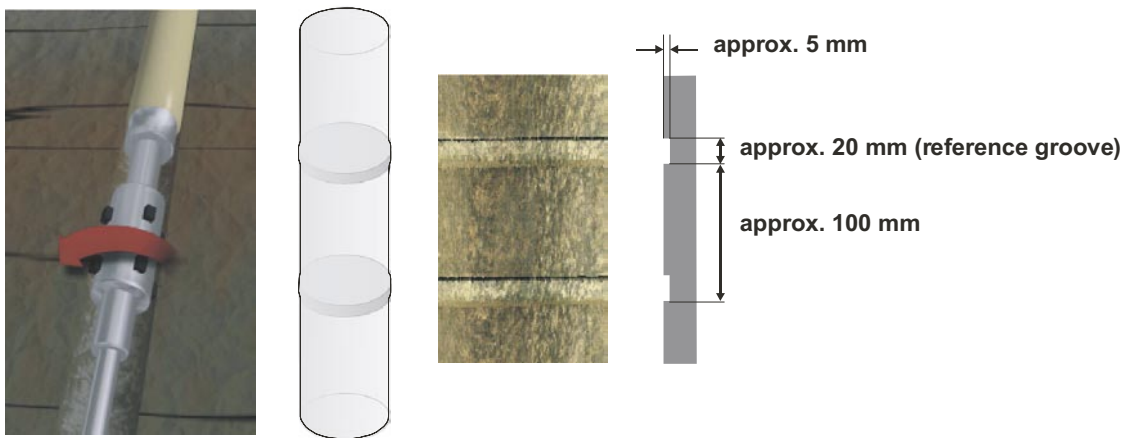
Layout and design of reference grooves. The milling tool shown to the left.
